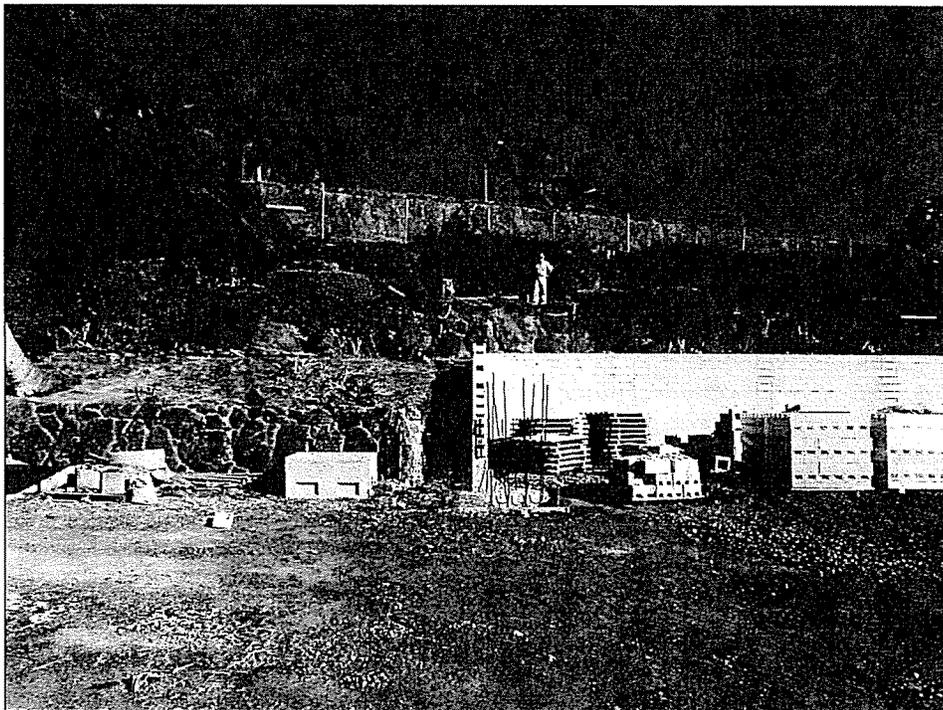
High rock walls along boundary of property adjacent to Portlock Road, northern section, view to the east; note large graded area with stockpiled construction material (CSH photo)
